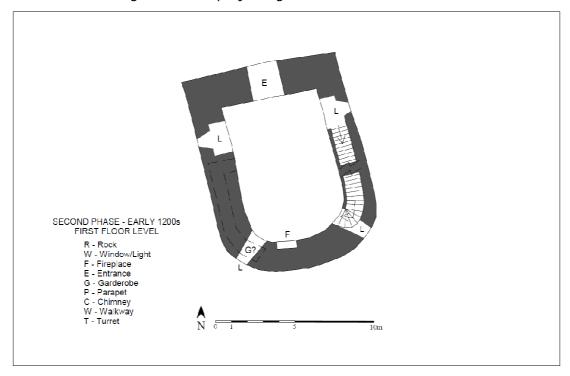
First Floor Level of D-Shaped Tower *c*.1200
